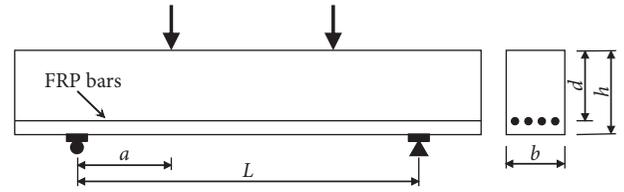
FRP bar reinforced concrete beams without web reinforcement.
